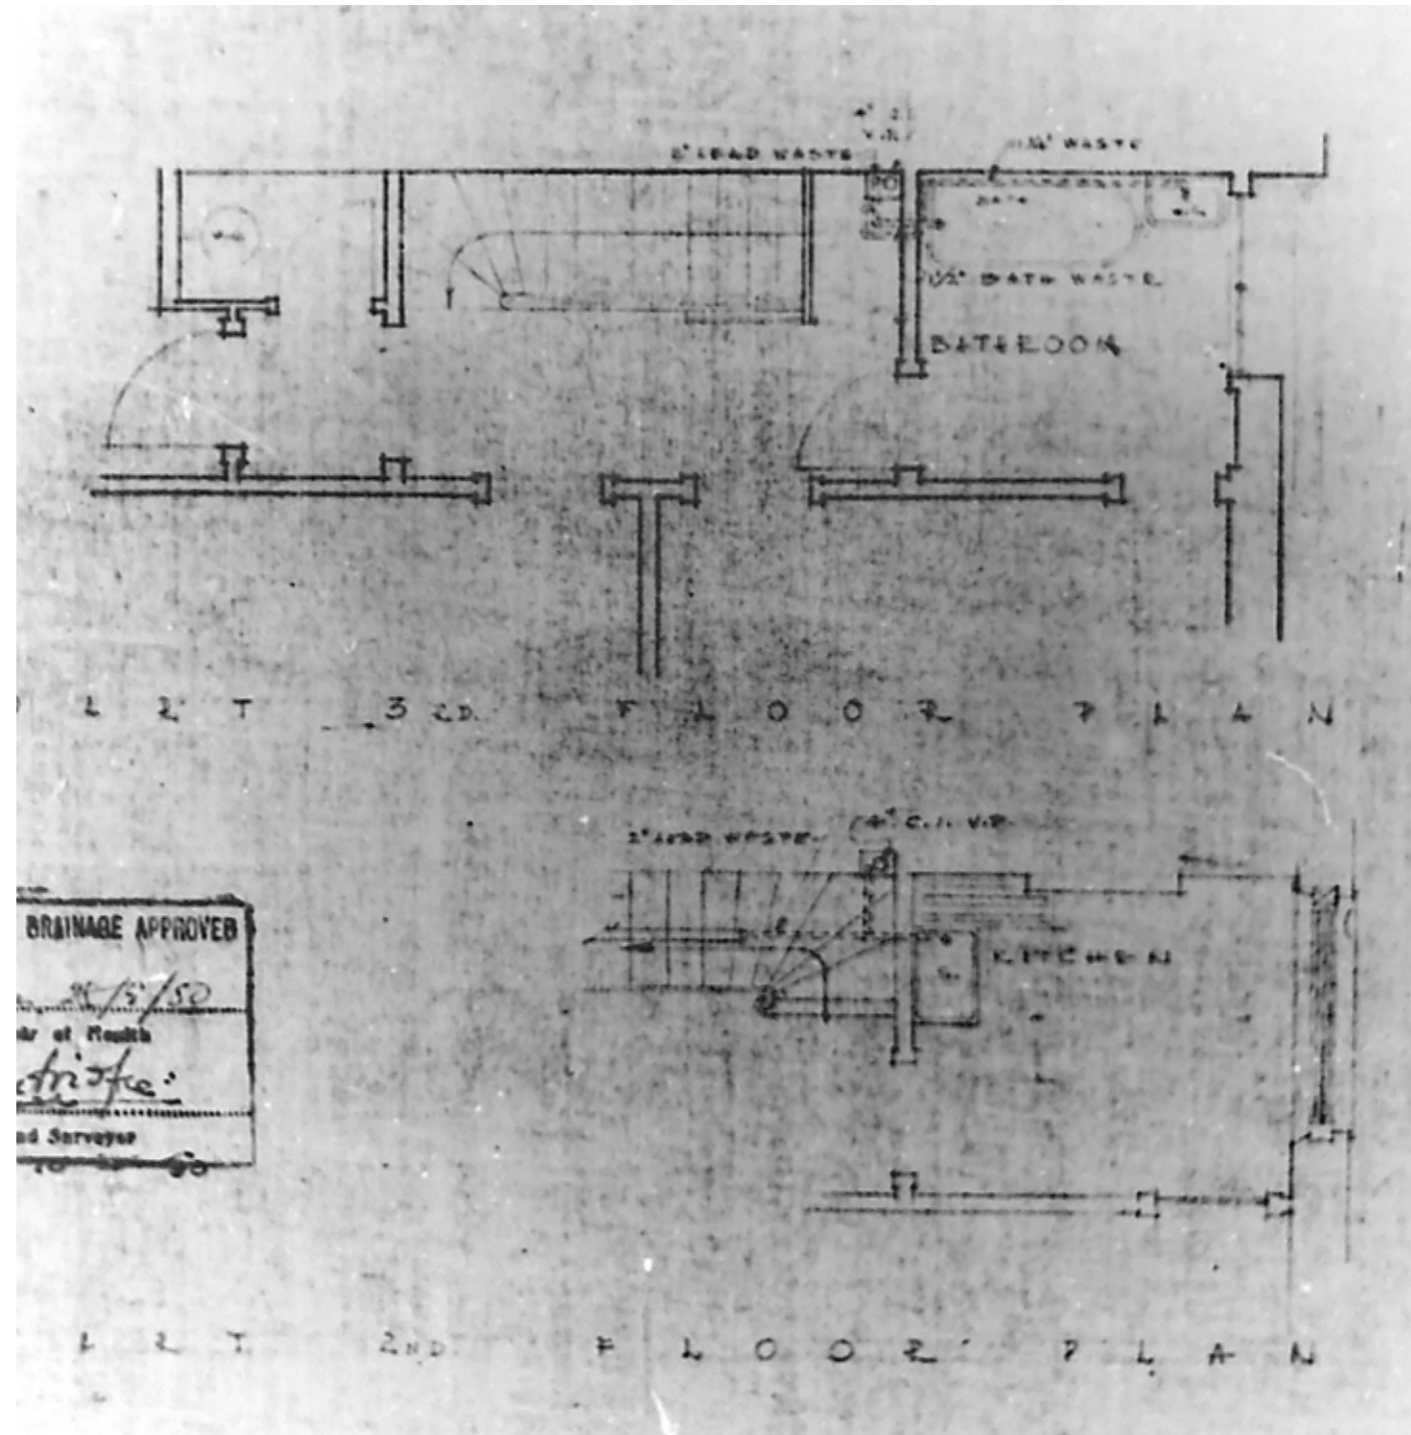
Plan showing part second and part top (third) floor of 8 Gloucester Gate.
